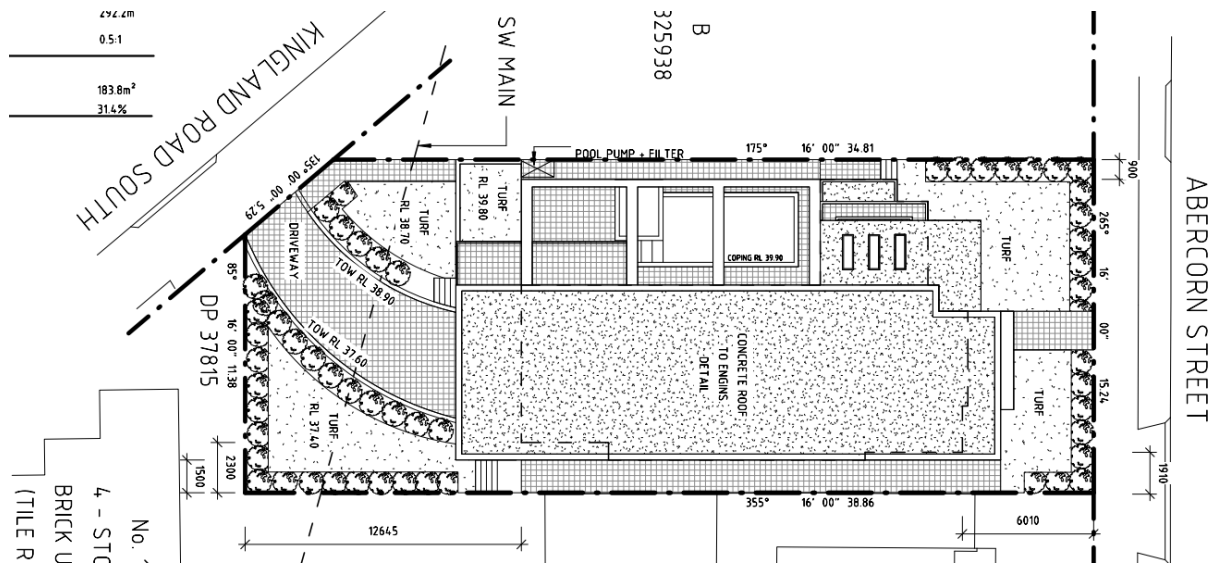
Extract of the Site Plan, illustrating duel frontage and allotment shape
